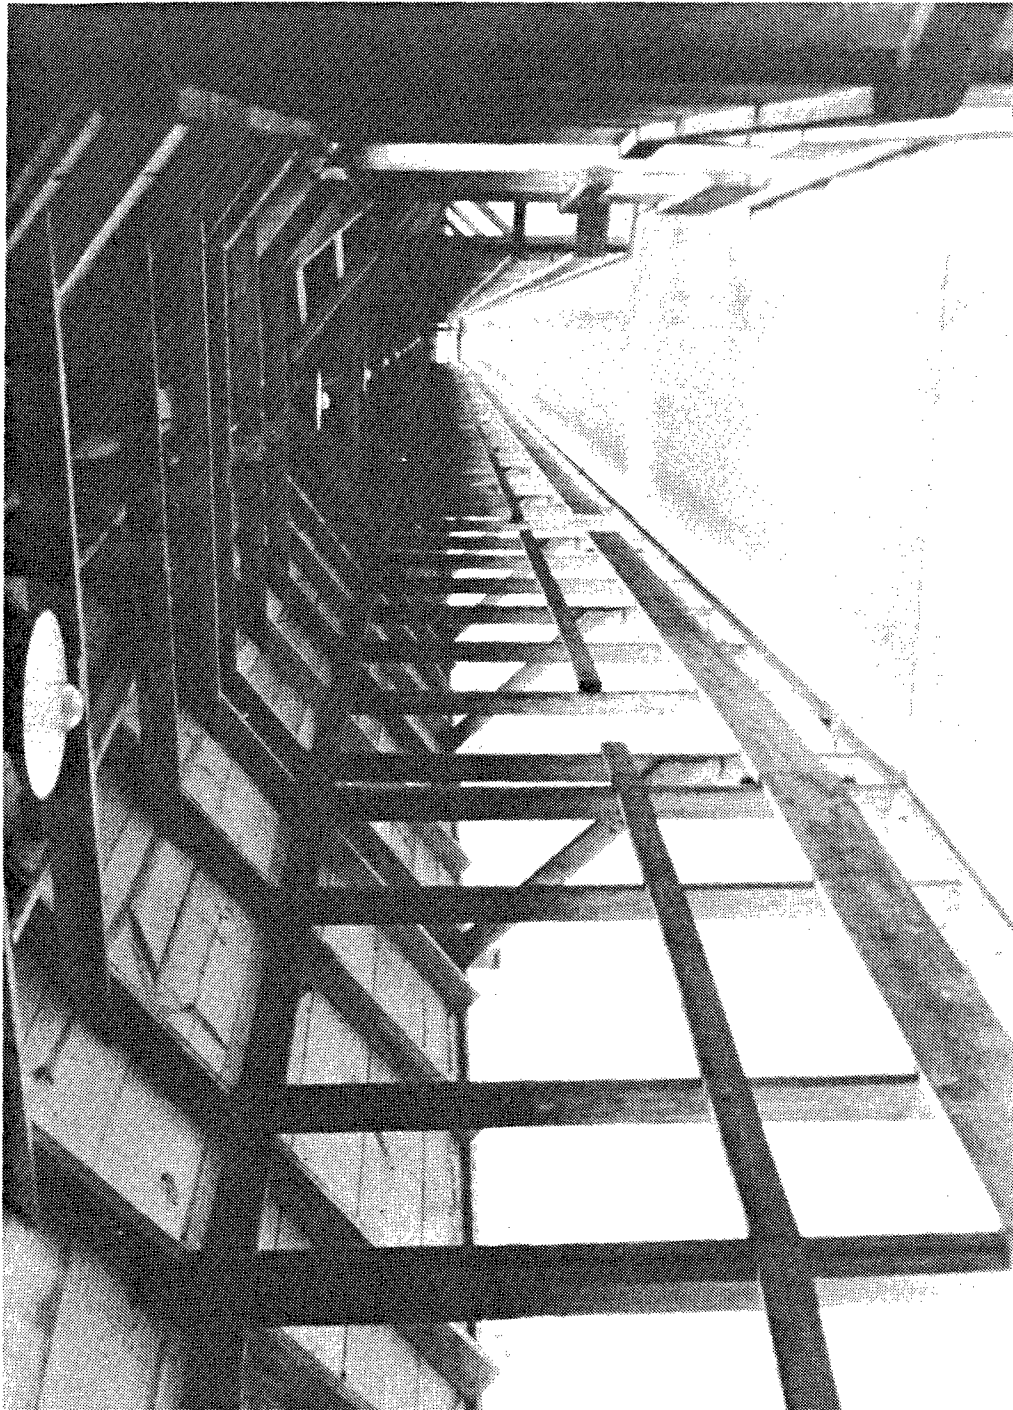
Covered walkways between Incorporation Buildings (courtesy of Holston AAP Photo Set No. 25-B [on file Engineering Vault, Building 26]).
